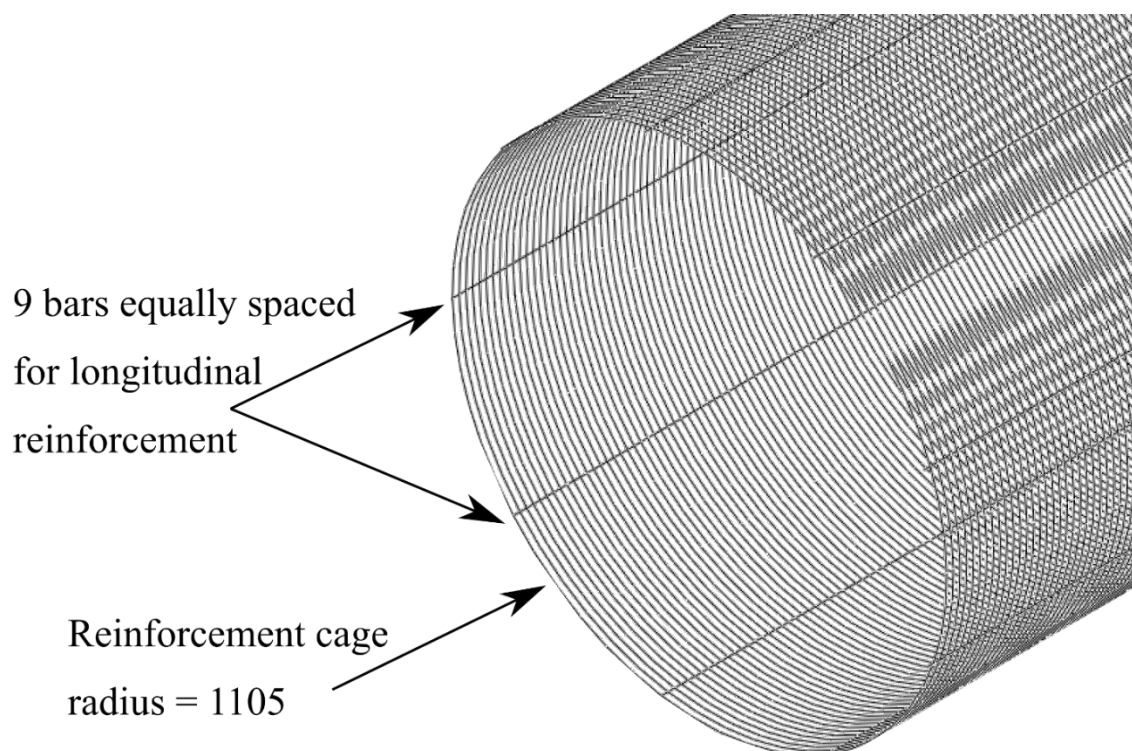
ABAQUS model of the pipeline reinforcement cage (all dimensions are in mm)
